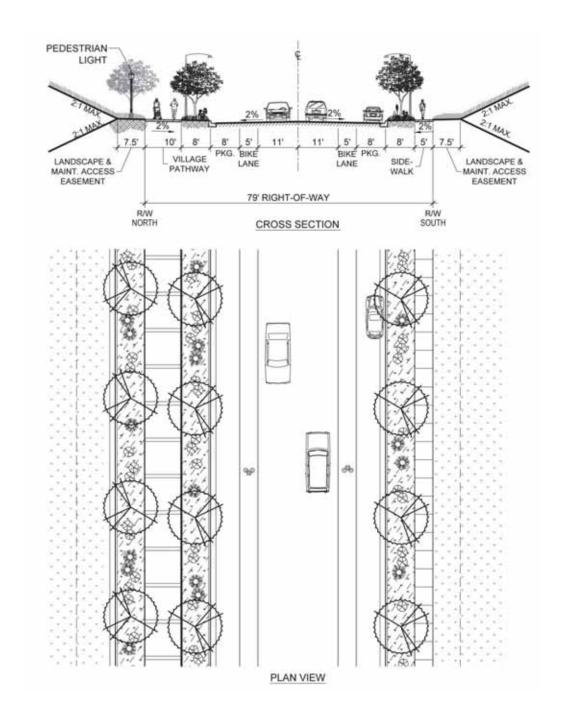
Residential Promenade Street (Modified with Village Pathway)
